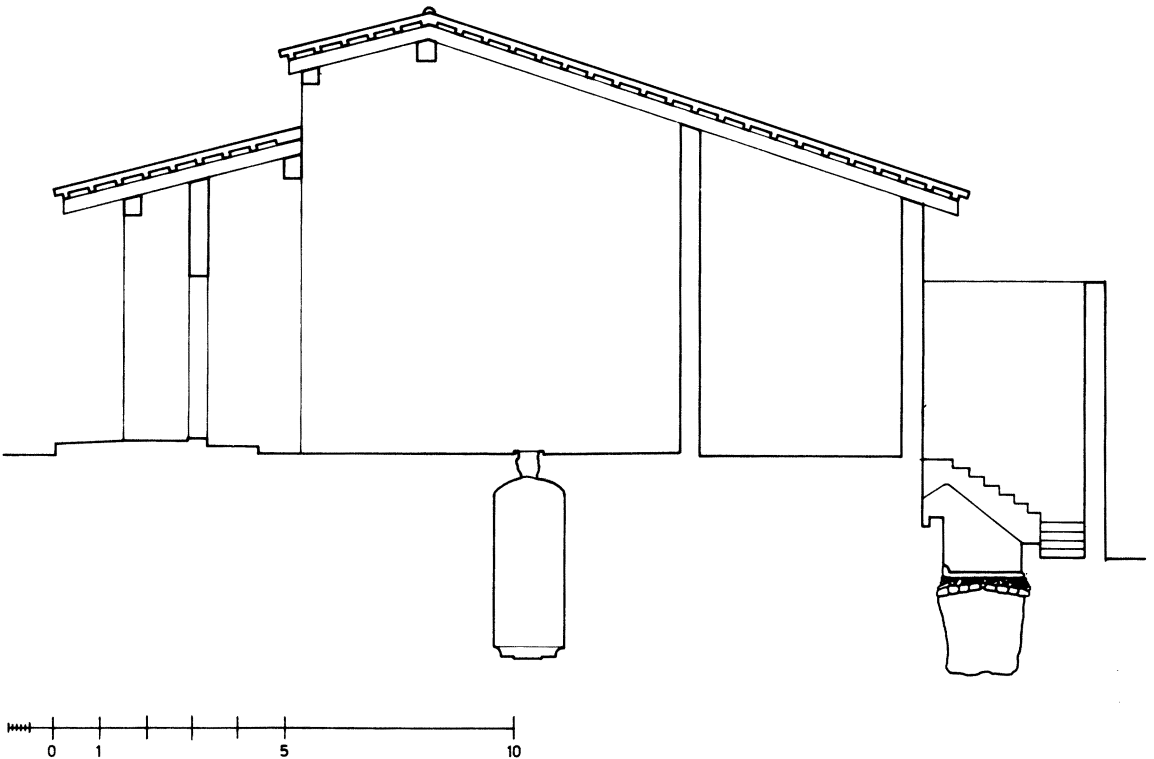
East Block, Periods 1.1-1.3: House of the Salvii, restored section/elevation
